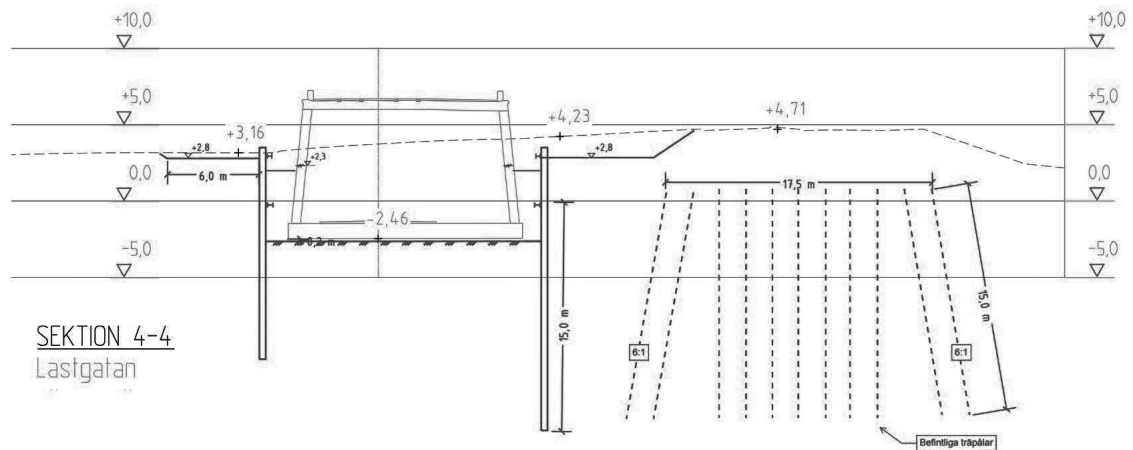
The studied section showing the finished construction as well as a road embankment with existing wooden piles beneath.
